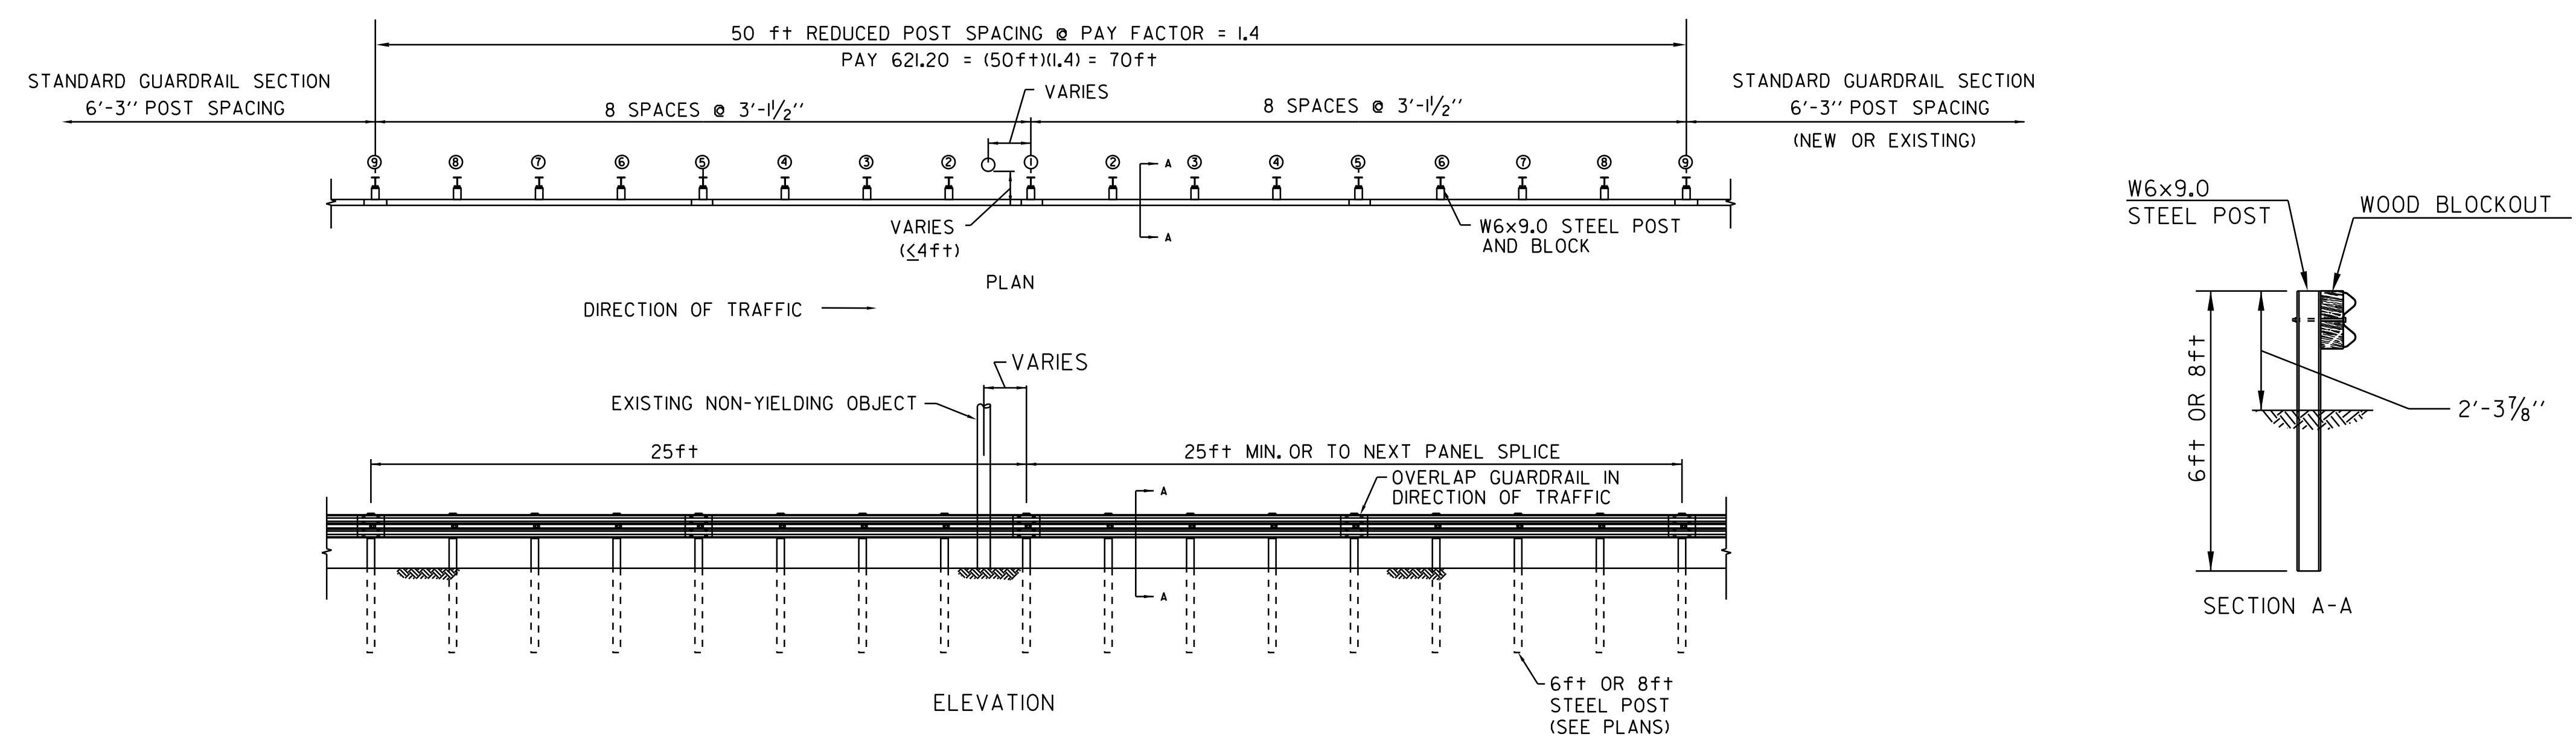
DETAIL OF STEEL BEAM GUARD RAIL AT LARGE CULVERTS
